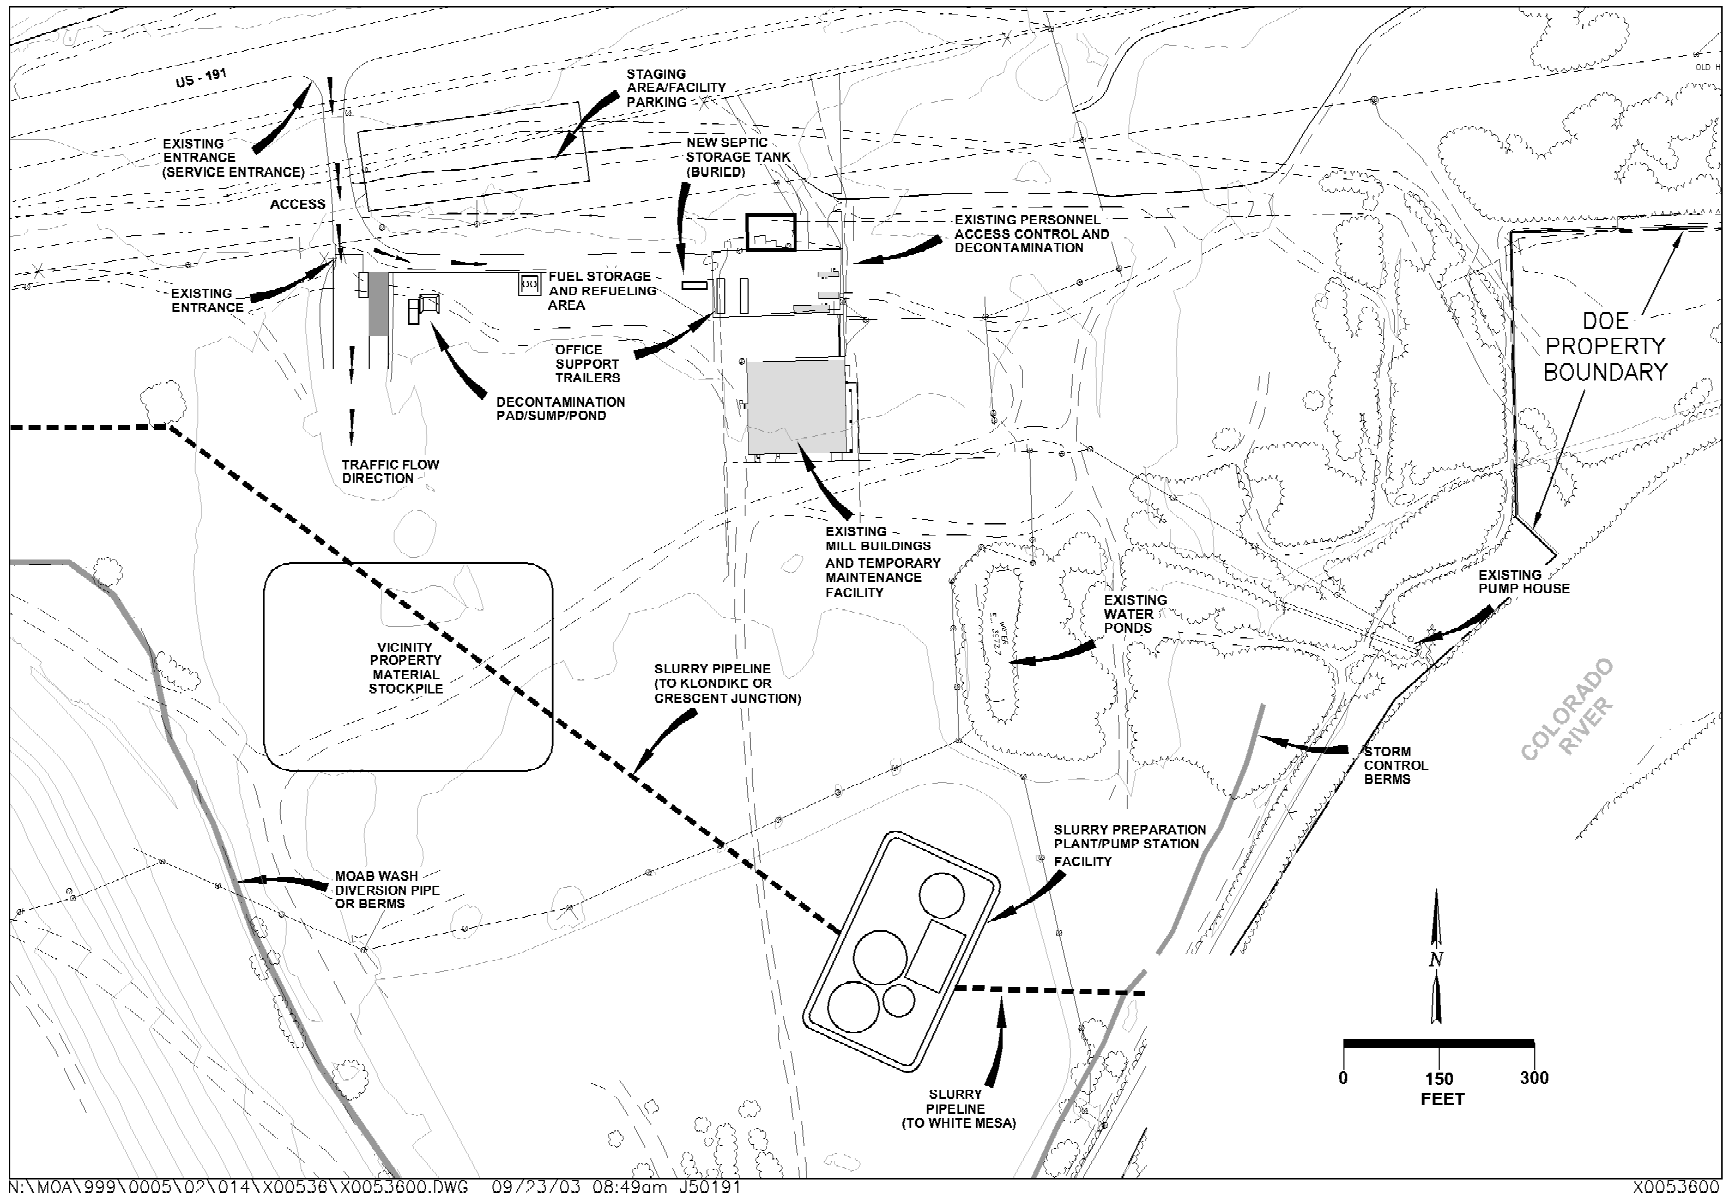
Locations of Proposed Slurry Pipeline Facilities at the Moab Site
